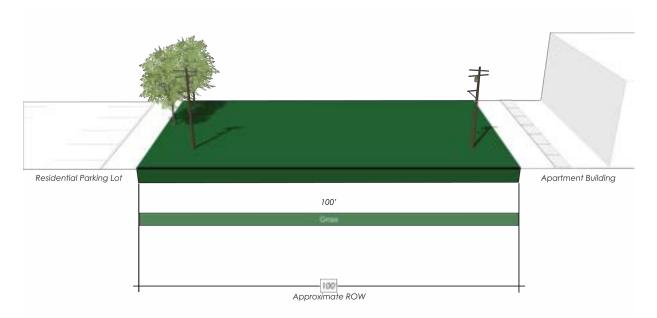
New Riggs Road ROW – Existing Cross-Section (Looking North)
